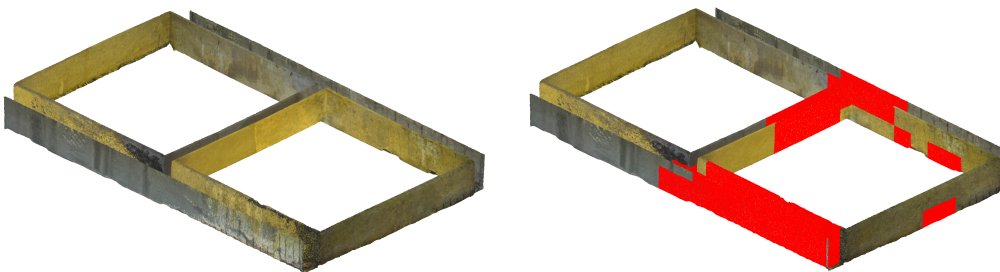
(a) Detected spalling damage in the left bridge console, and (b) detected spalling damage in the right bridge console.
